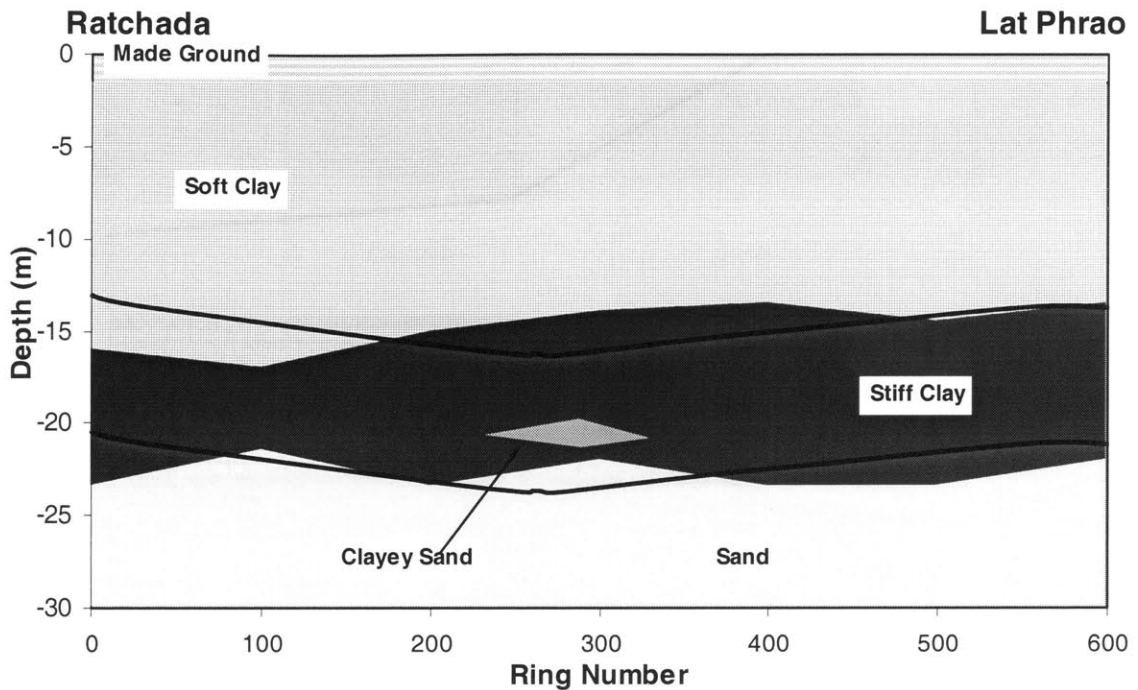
Subsurface conditions of tunneling section (southbound) between Ratchada and Lat Phrao stations (Section B)
